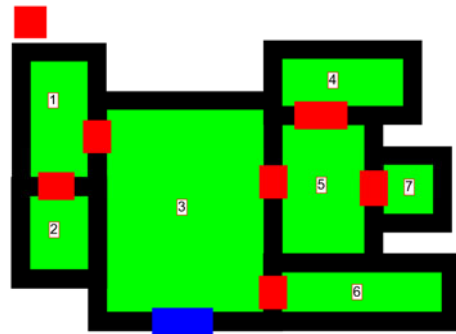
Floor Plan – room numbers are not shown in the actual graphic
